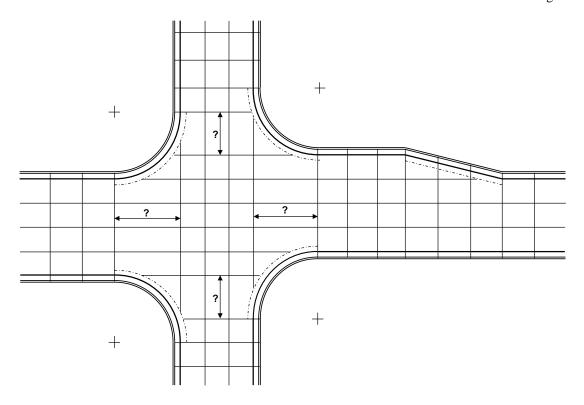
Typical Joint Layout for a Rigid Pavement Intersection (Shows Lane Configuration, Steps 5 thru 8)
